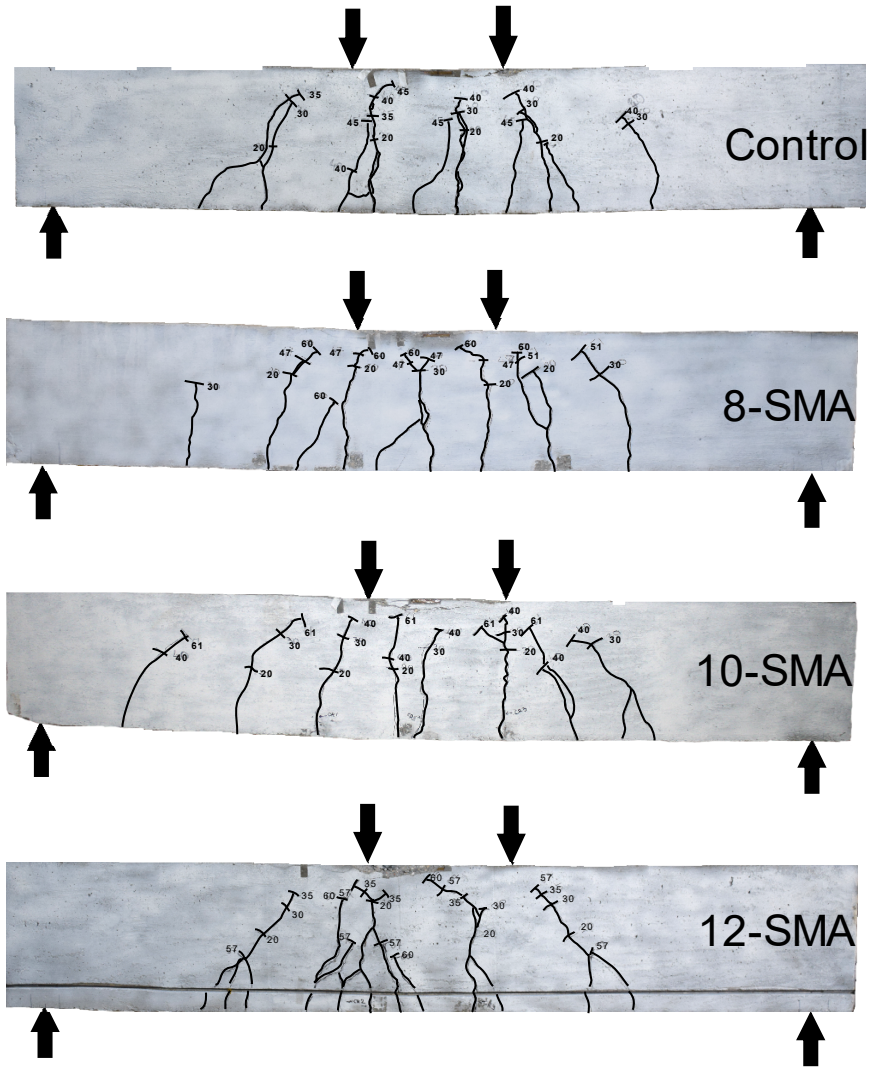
Crack patterns of the reinforced concrete girders after failure. Numbers indicate load in kips.
